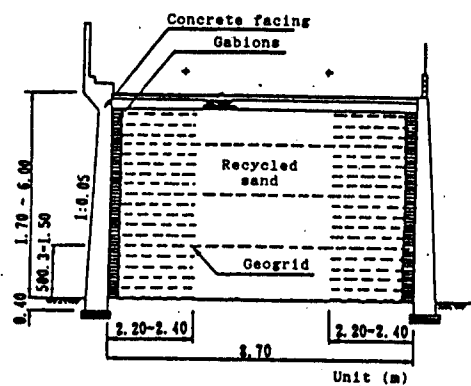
Typical cross-section of a newly added GRS retaining wall for a railway embankment, Kobe (Tatsuoka, et al 1995)
